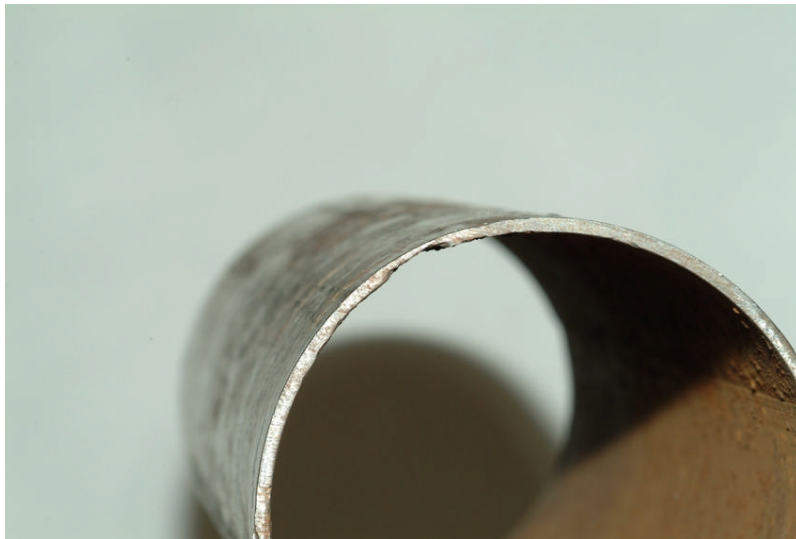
Wall Thinning & Pitting in a Dry Fire Sprinkler System
